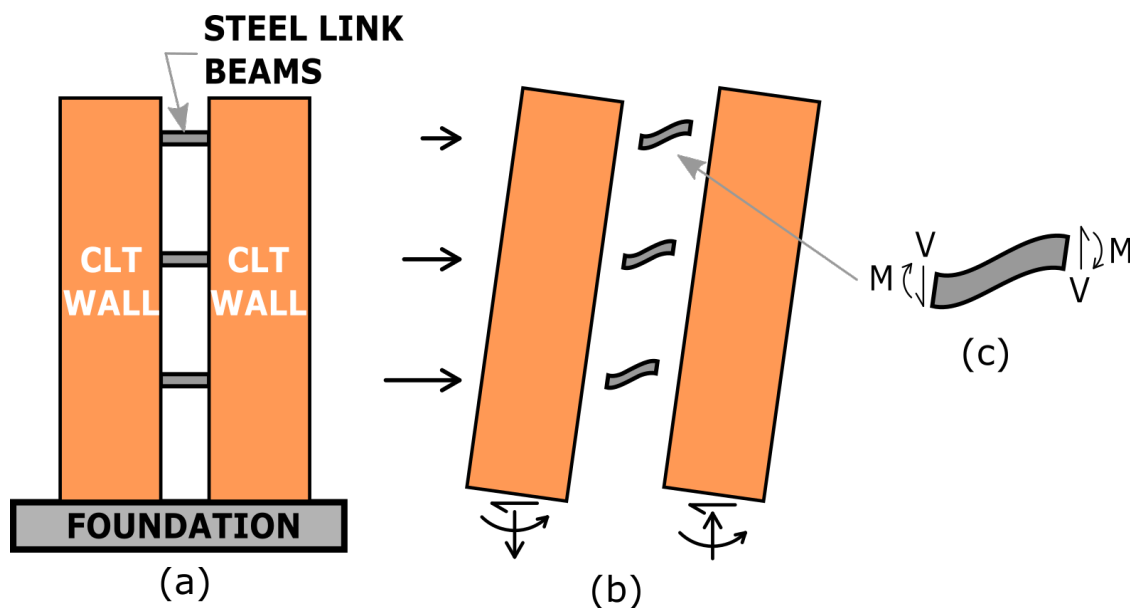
Three-storey coupled CLT wall schematic (a) and free body diagrams of wall system (b) and link beam (c) when subjected to lateral loading.
